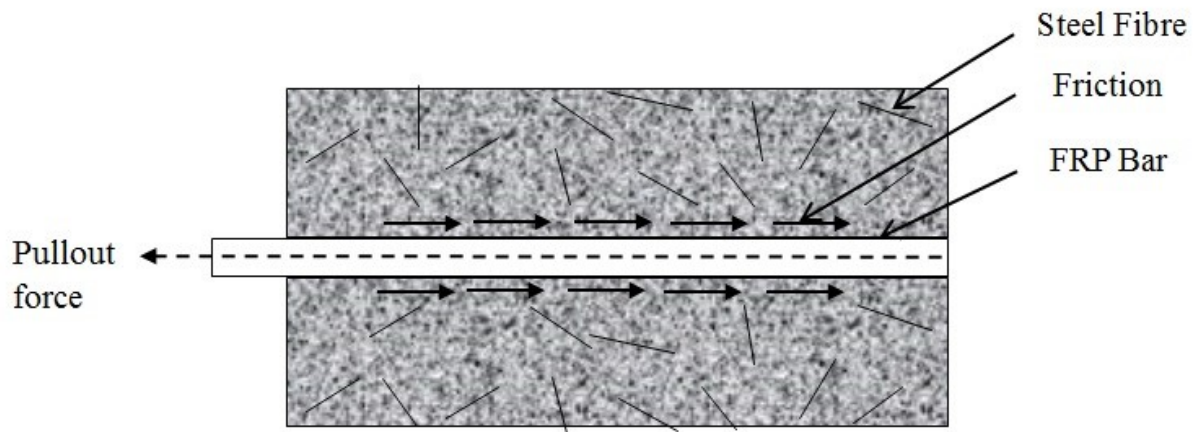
Pullout failure pattern of GFRP bar in concrete matrix with steel fibre
